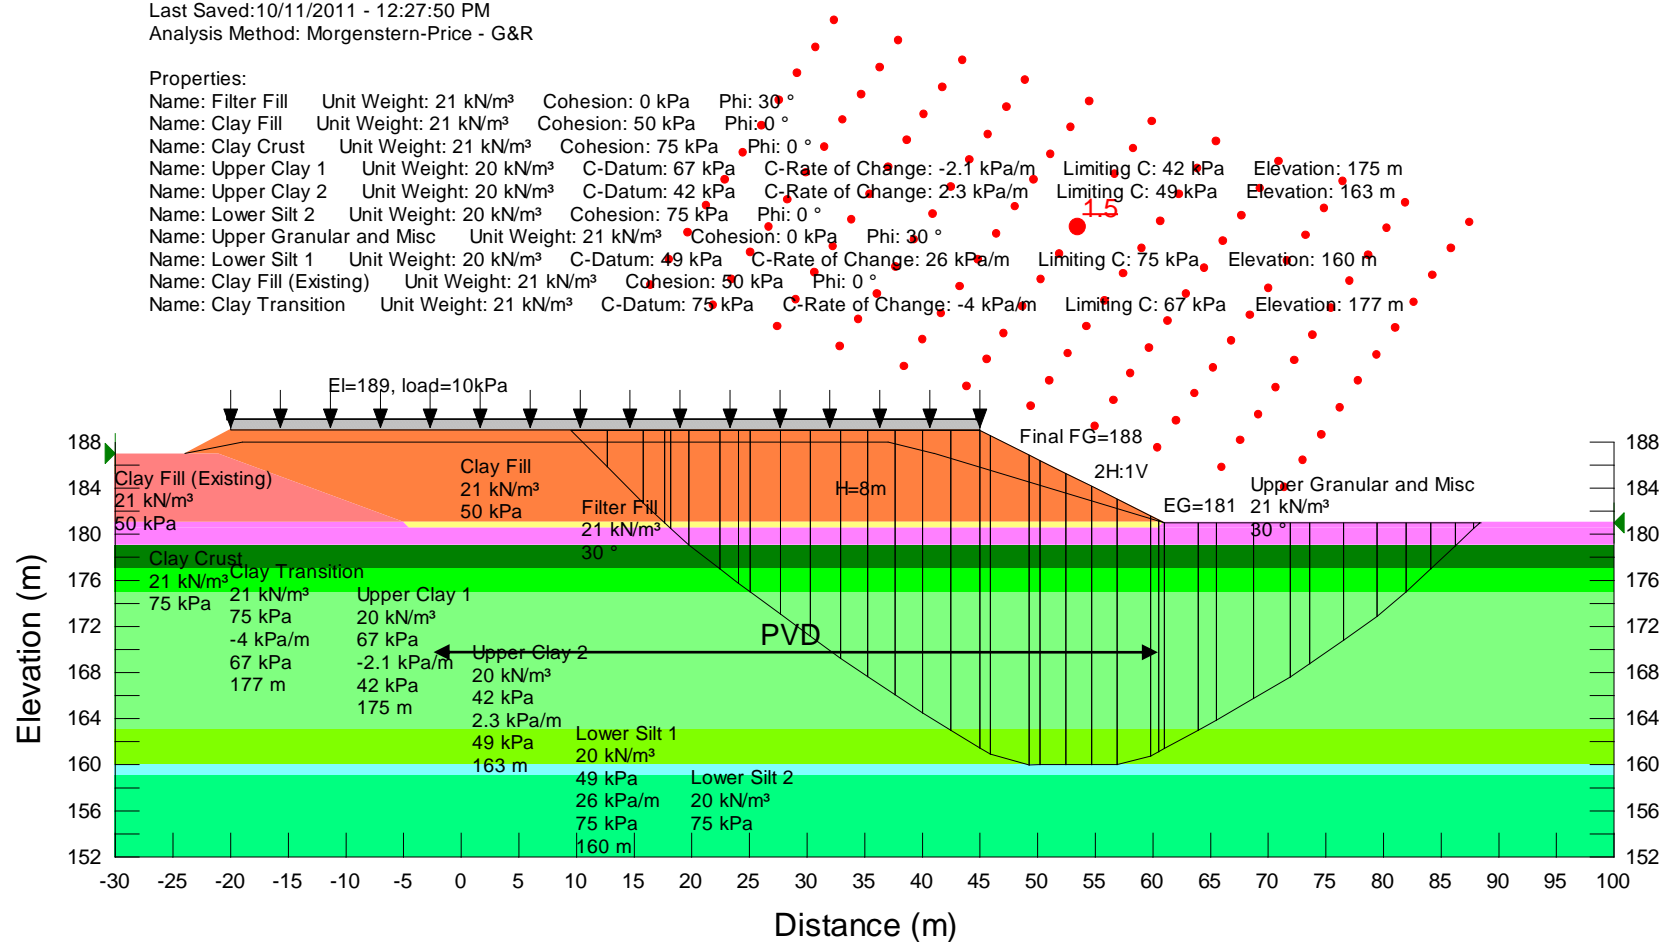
Slope Stability Result – Section 4 (Sta. 11+775W) – Stage 2 (Final Config) – Short-term Loading
